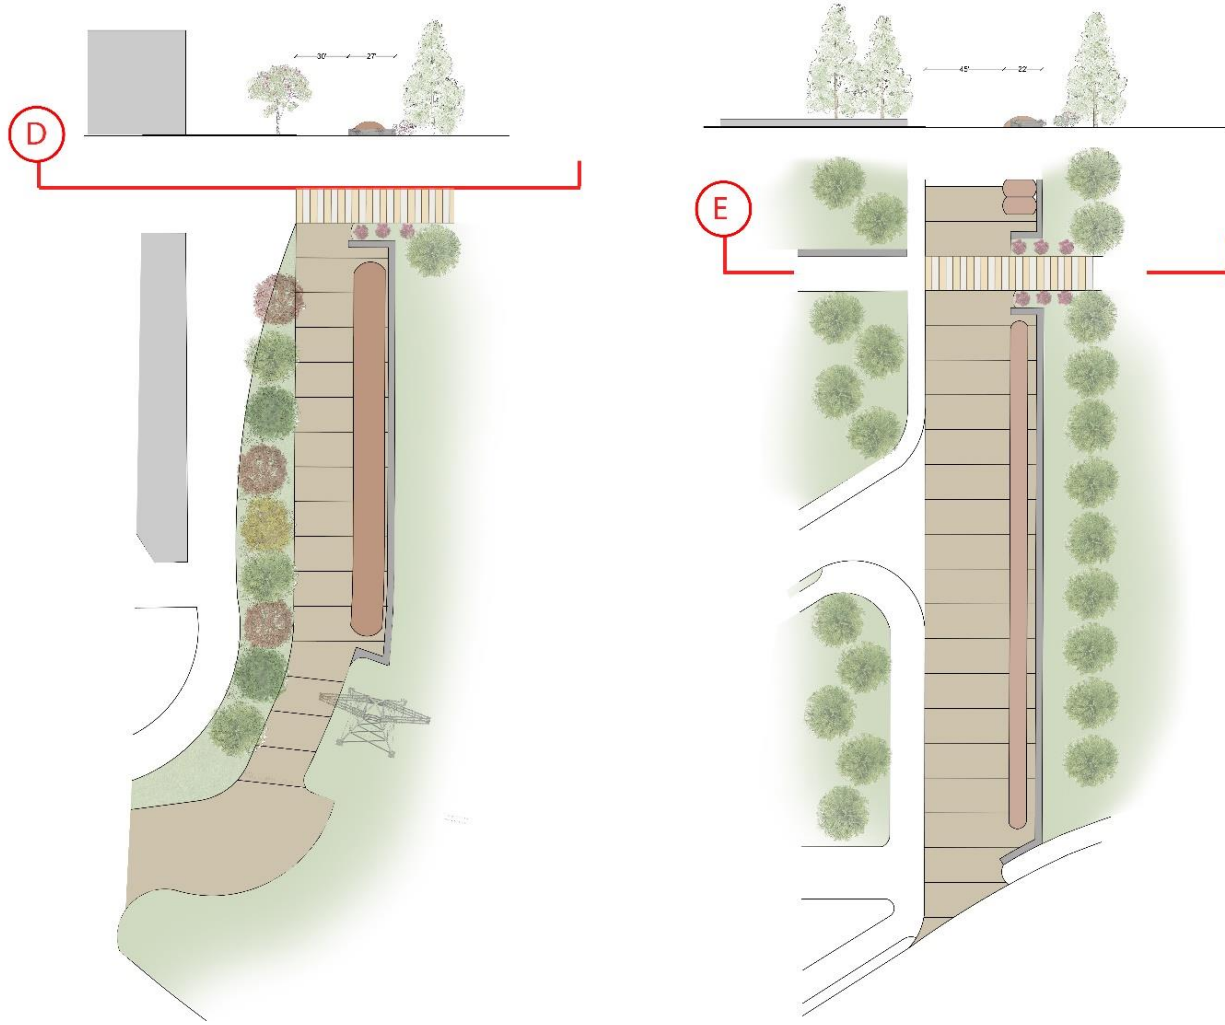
Sections D and F. Entrances to the site connecting townhouse neighborhood with site.
